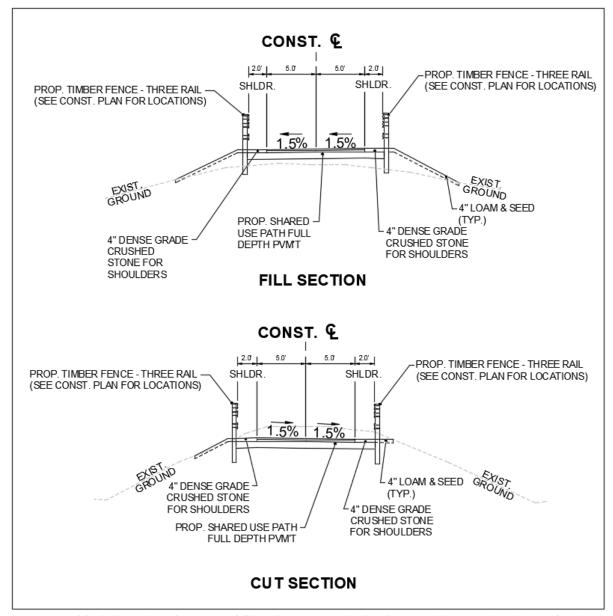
Typical sections for areas of fill and cut, respectively, shown with protective timber fencing.
